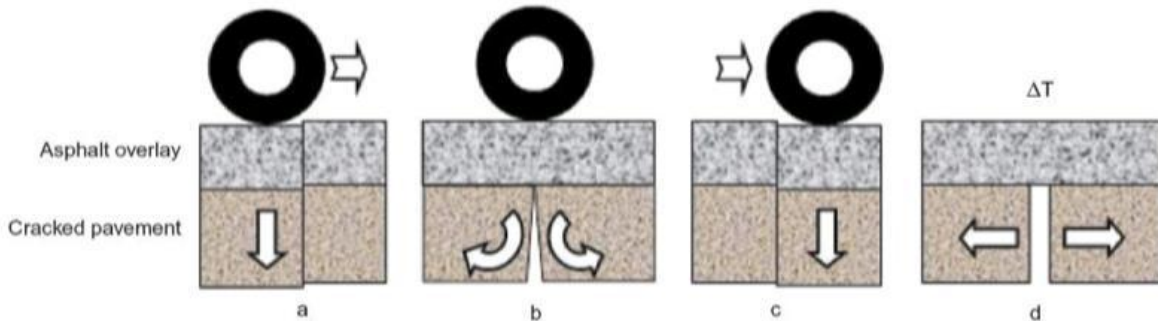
Displacement in pavement cracks and joints (Baek and Al-Qadi, 2009)
